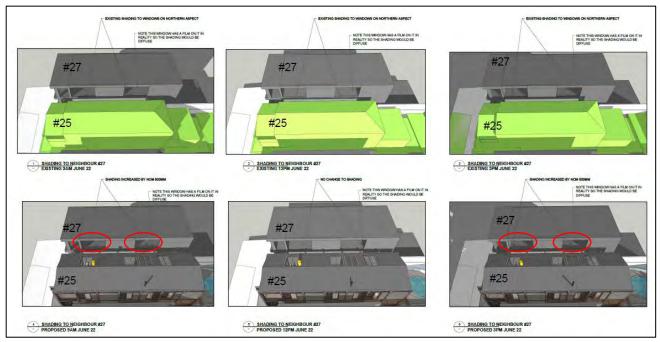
Shadow diagrams showing shadow impacts to windows of 27 St Thomas Street, Bronte (Source: Clinton Murray Architects, 2023)
